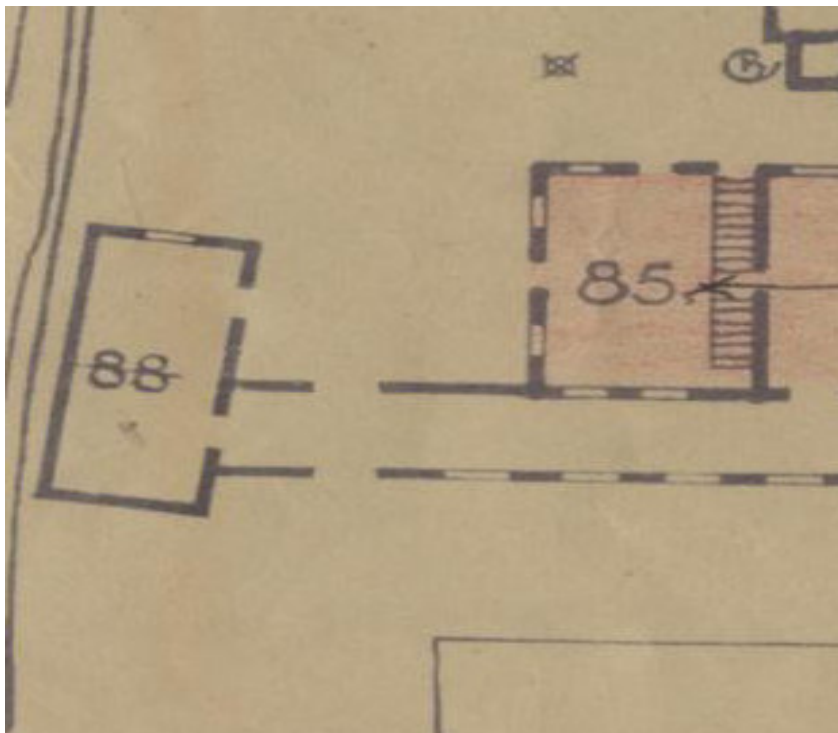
The area of Buildings B (85) and C1 (88) in 1936. (source: Schofield's Insurance Plan of 1936)
